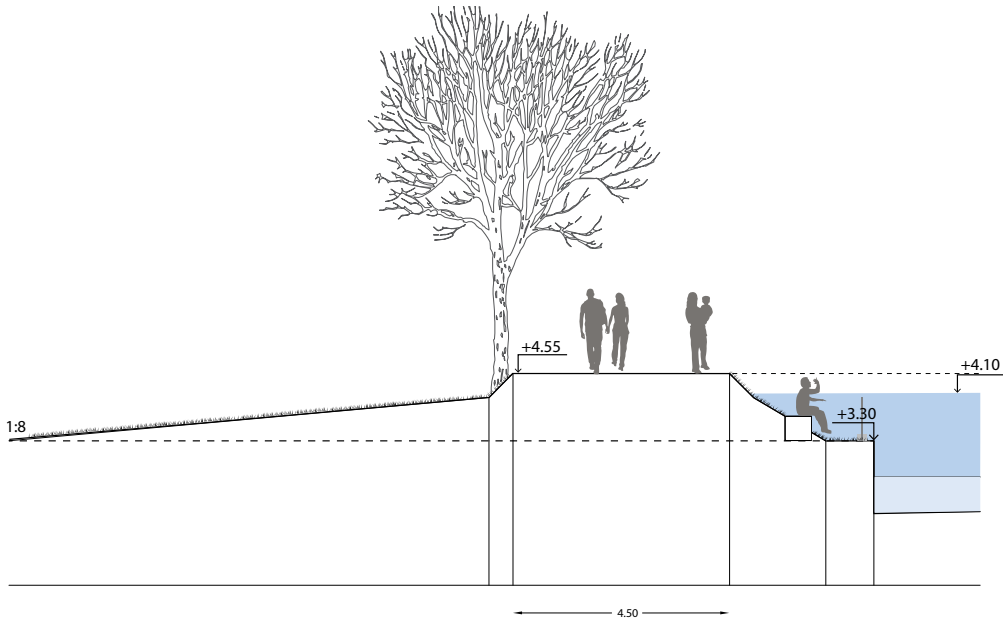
Proposed situation. A new dike or levee could be added as a walking route with grass steps to the river
